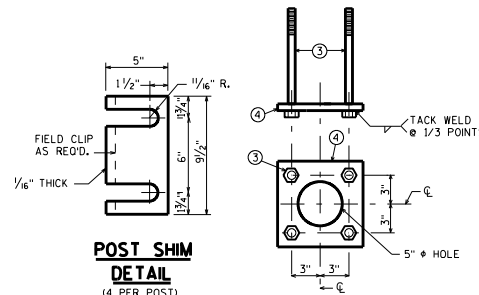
DETAIL FOR END POSTS WITH THREE BEAM RAIL ATTACHMENT
